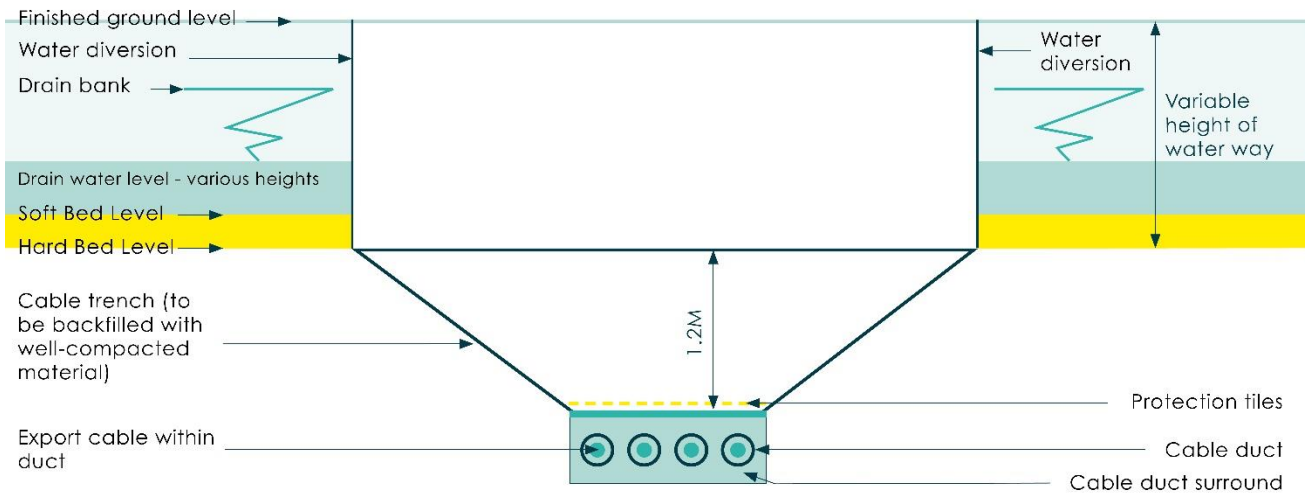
Riparian watercourse crossing cross section, showing cable installation with water diversions in place
